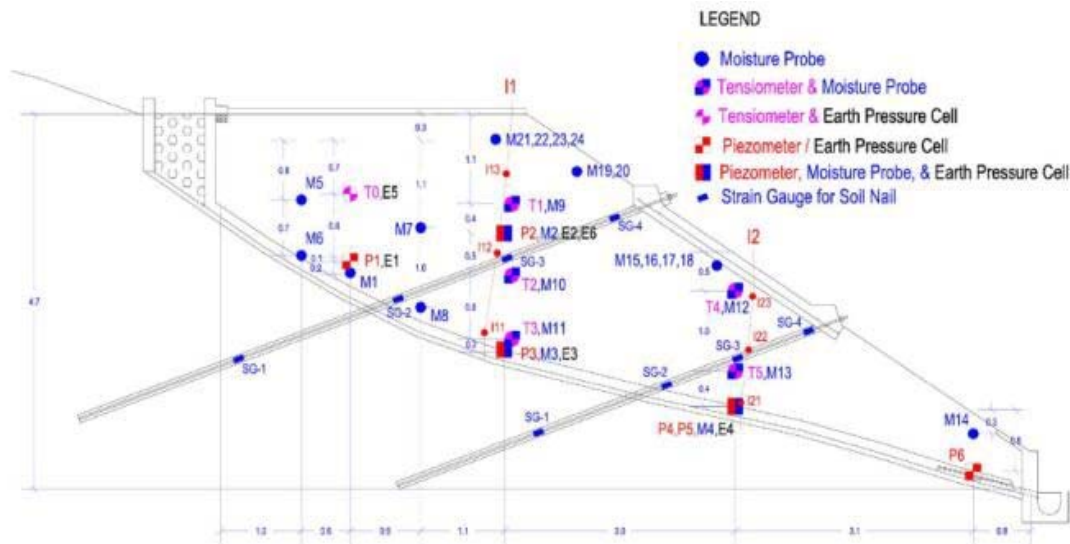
Arrangement of Instruments for a Tested Soil Nail Wall (after Li et al., 2008).
